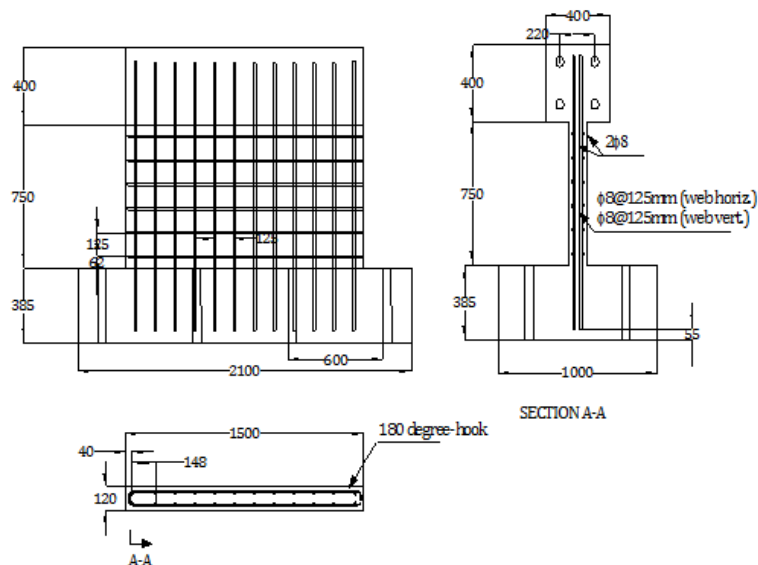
Geometry and Wall Reinforcement of Specimen T3-S1 (Terzioglu, 2011).
